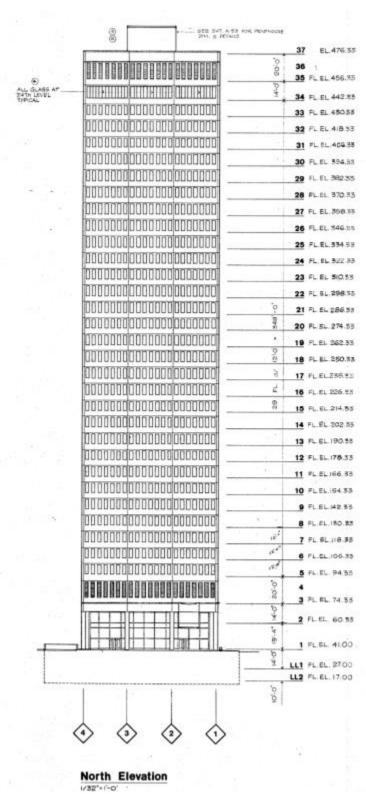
The Tower north elevation (skywalks are excluded, original drawing A17 by Kendall Griffith Russell Artiaga March 1973).
